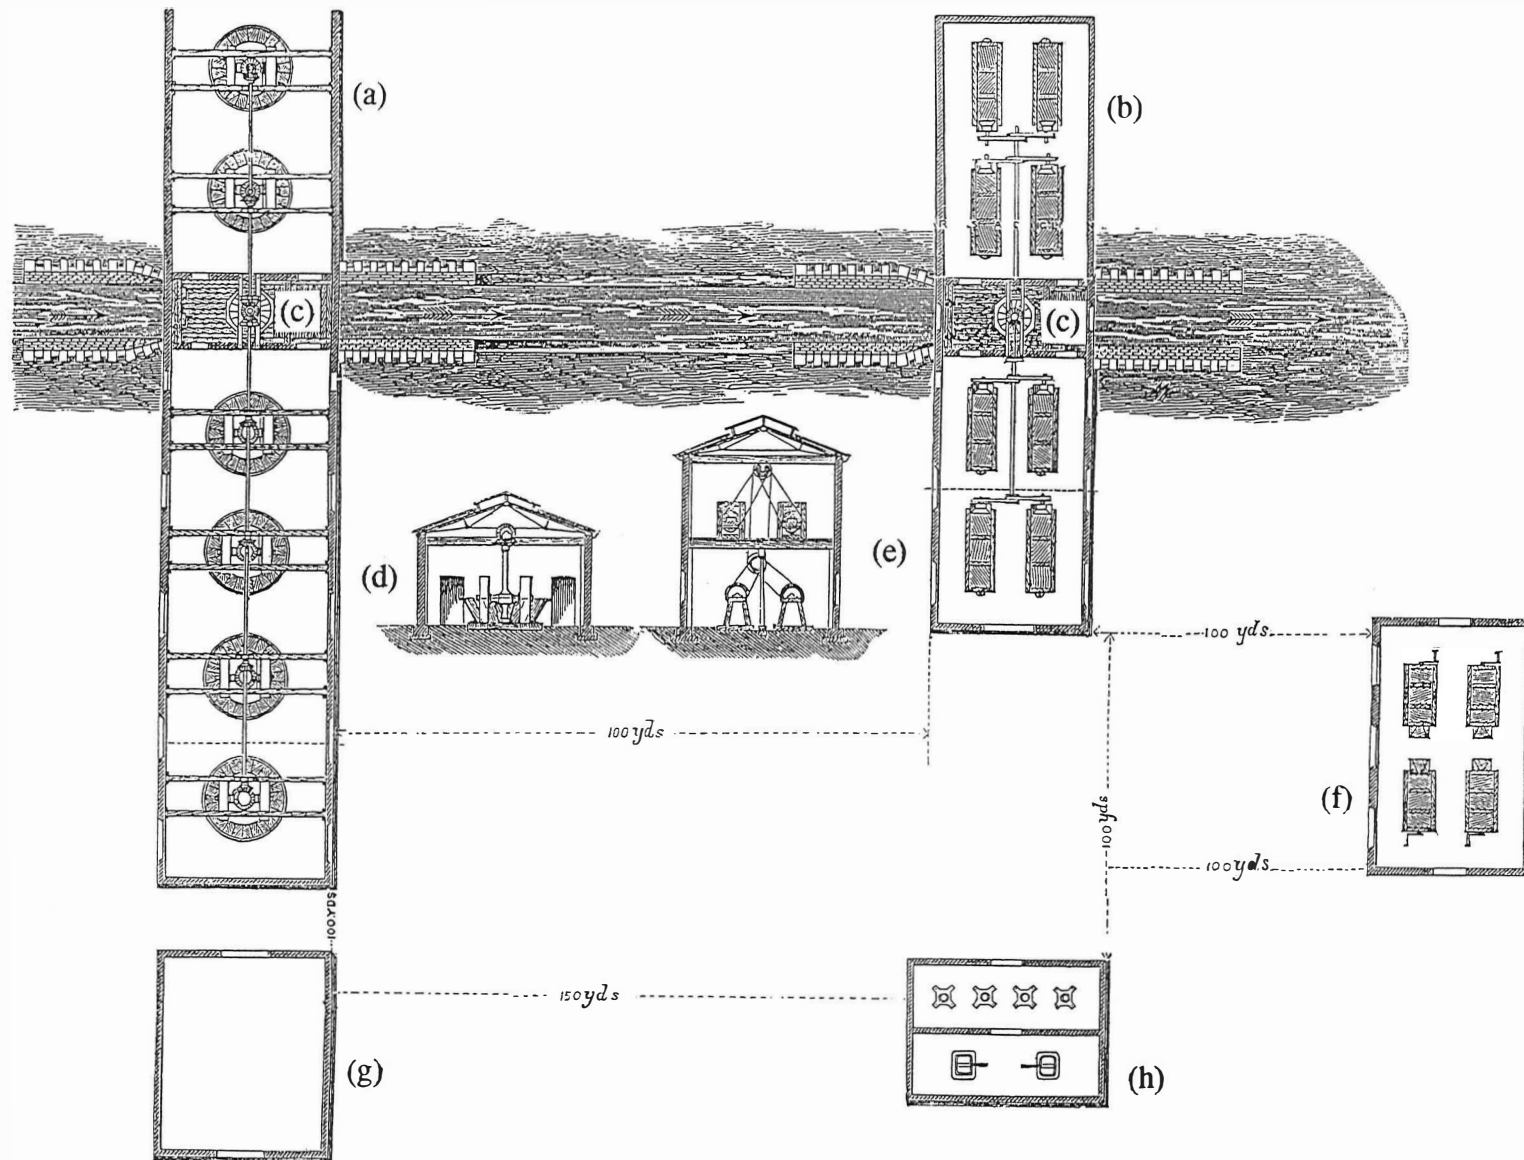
Gunpowder machinery manufactured by J & H Gwynne for the Italian Government. (a) Grinding mills (4 in number). (b) Mixing barrels and glazing cylinders. (c) Water turbines. (d) Incorporating mills. (e) Breaking down and sifting cylinders. (f) Charcoal sifting. (g) Packing house. (h) Hydraulic presses.
